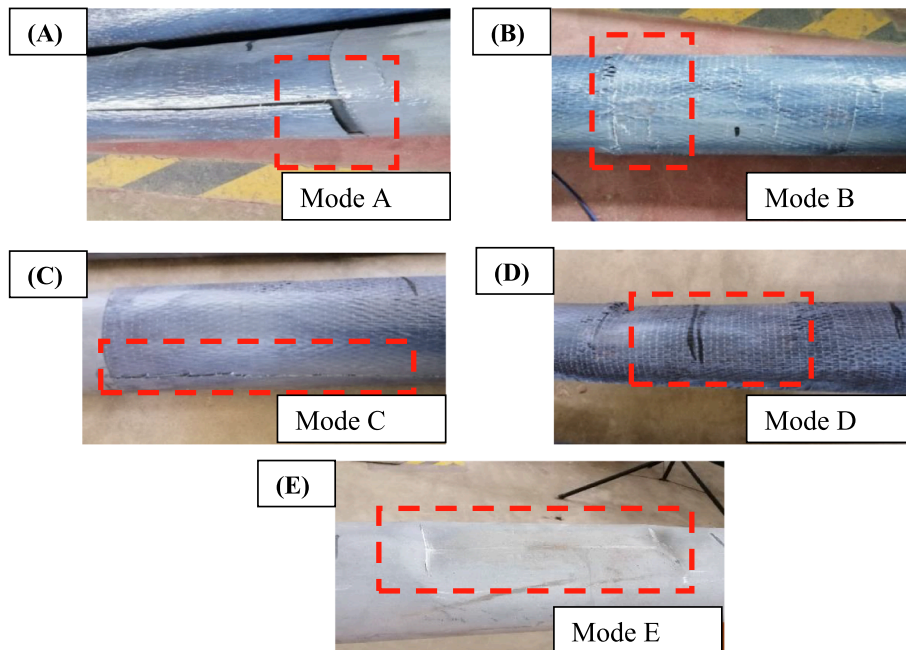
Major failure modes of tested beams; (A) end debonding (B) CFRP crushing close to the loading point (C) fracture of CFRP at the tensile face opposite side to the load (D) local buckling of steel tube near the loading point (E) Ductile failure of steel tube near the loading point.
